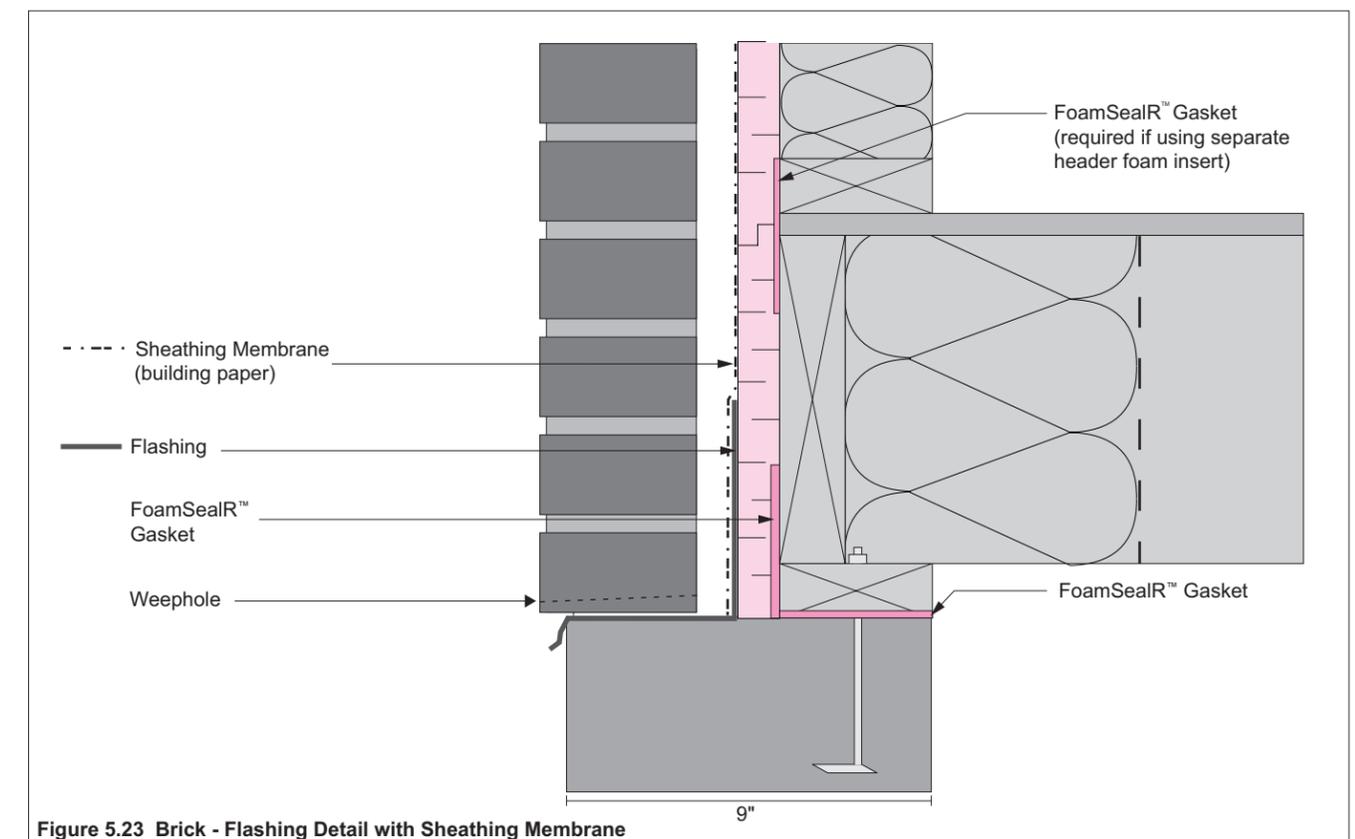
Brick - Flashing Detail with Sheathing Membrane
